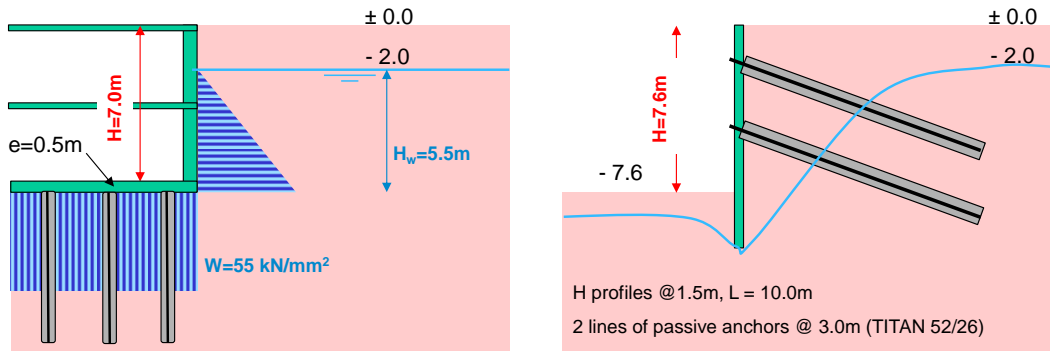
Adopted design approach (left) and constructive measures for the temporary excavation shoring (right)
